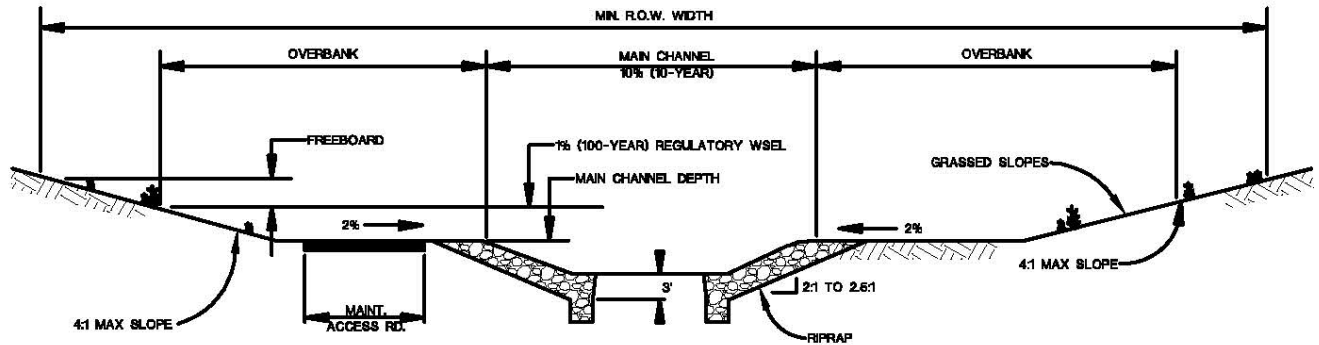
TYPICAL GRASS LINED CHANNEL SECTION TYPE B
